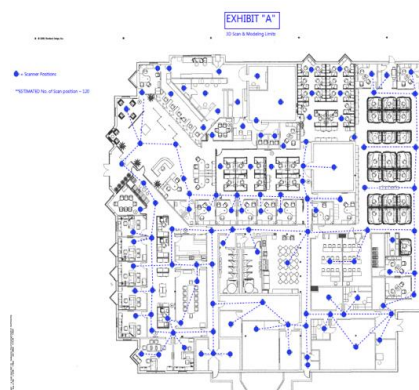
Bank Floor plan. Source: image courtesy ClearEdge3D
